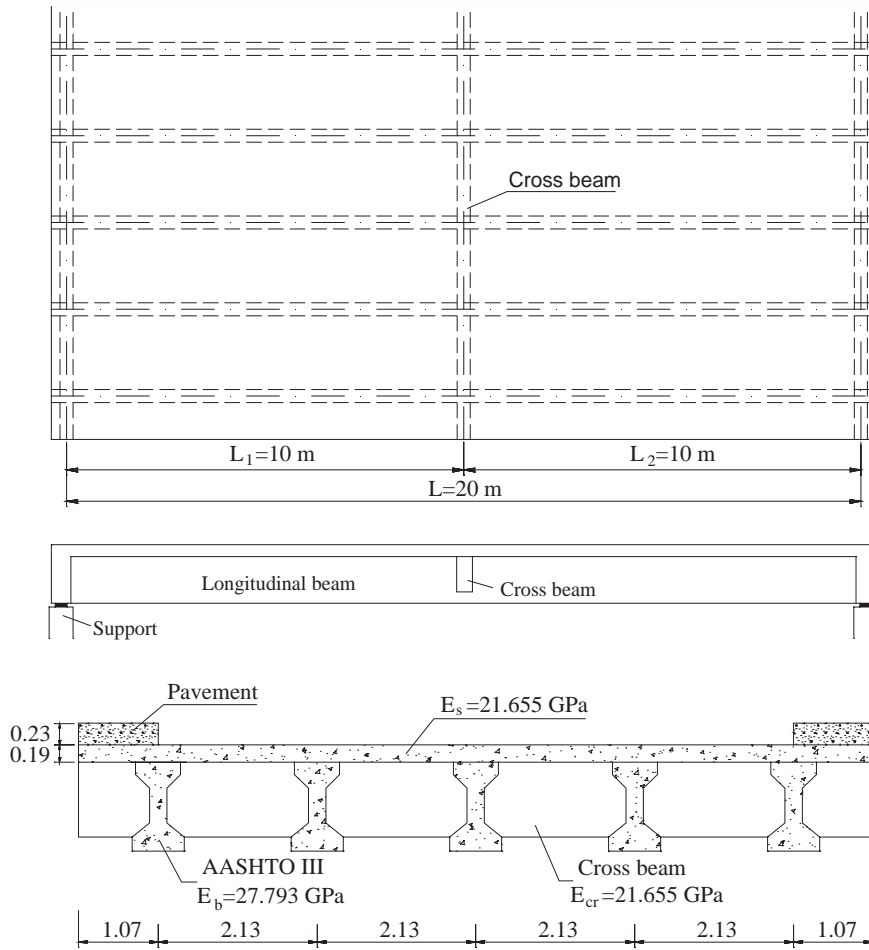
Plane and typical cross-section of a multi-girder bridge case.
